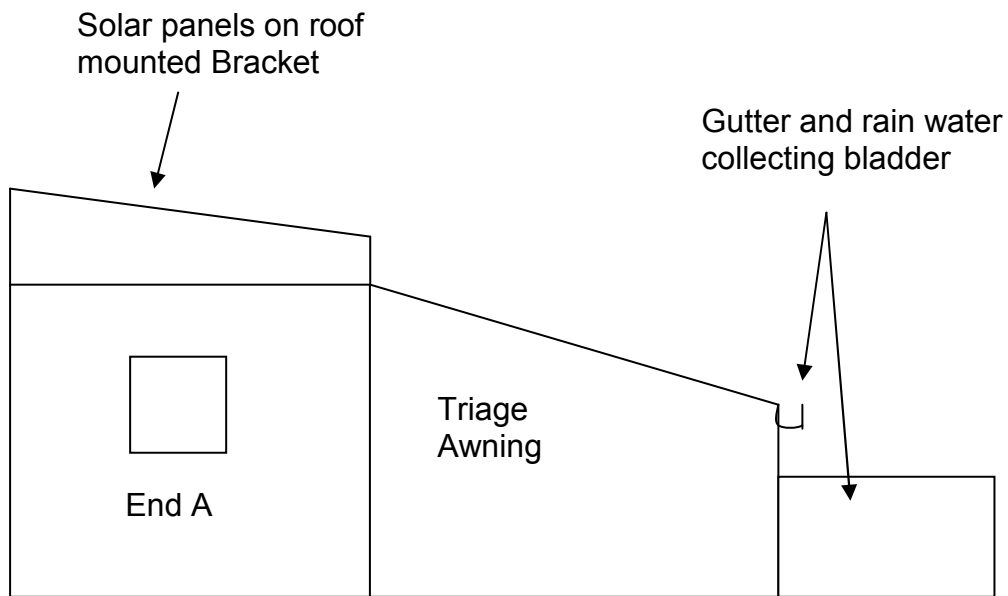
Shows the end elevation including the solar rack mounted on the roof, the awning (for triage) and water collection bladder including guttering.
